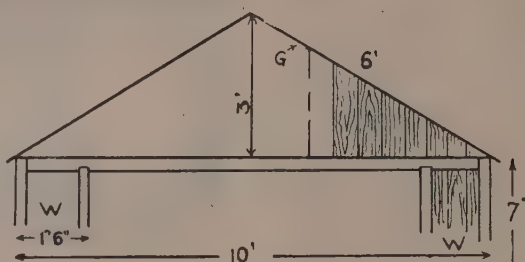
SINGLE-LINE LAY-OUT, SHOWING HOW TO FIND ROOF PITCH TO TAKE 6 FT. GALVANISED CORRUGATED SHEETS.
